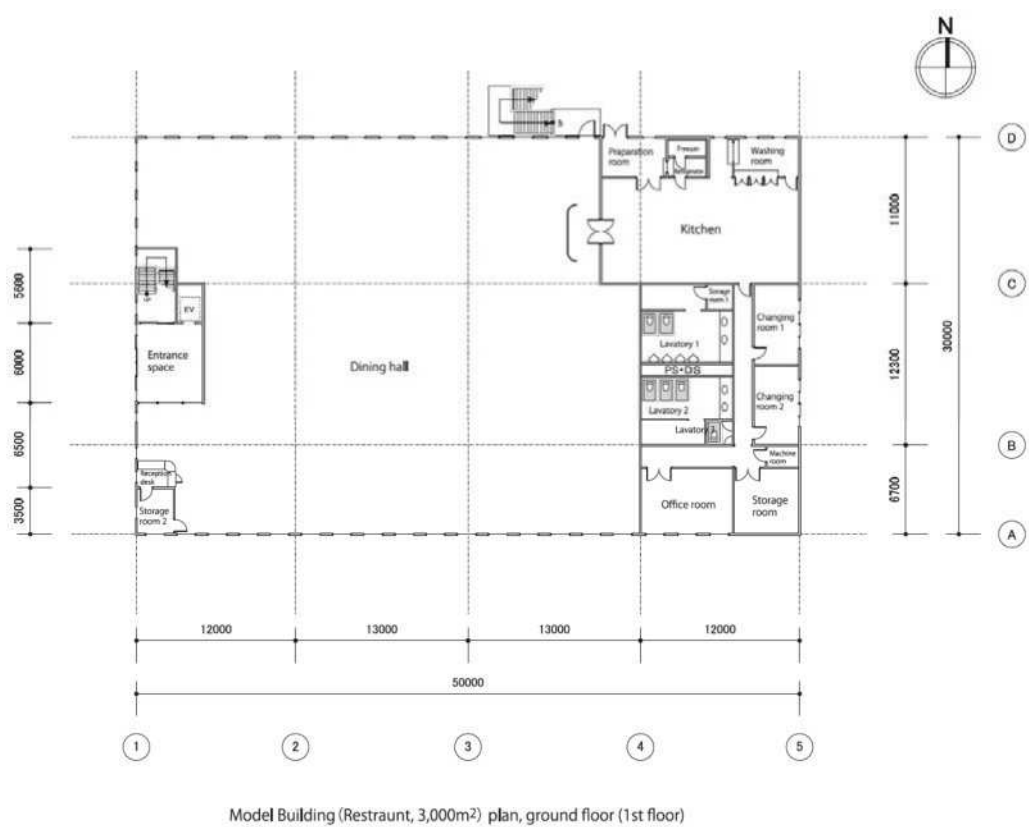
Model building (restaurant, 3 000 m²) plan, ground floor (first floor)
